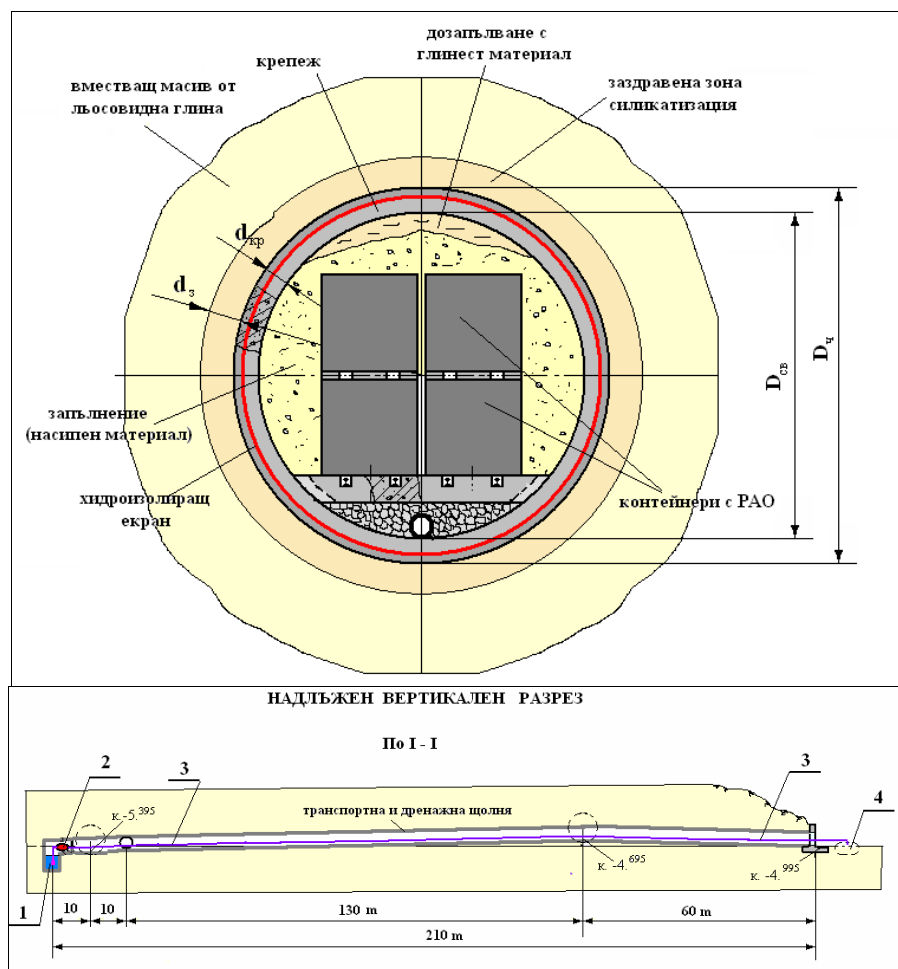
CROSS AND LONGITUDINAL SECTION OF A TUNNEL TYPE OF REPOSITORY
